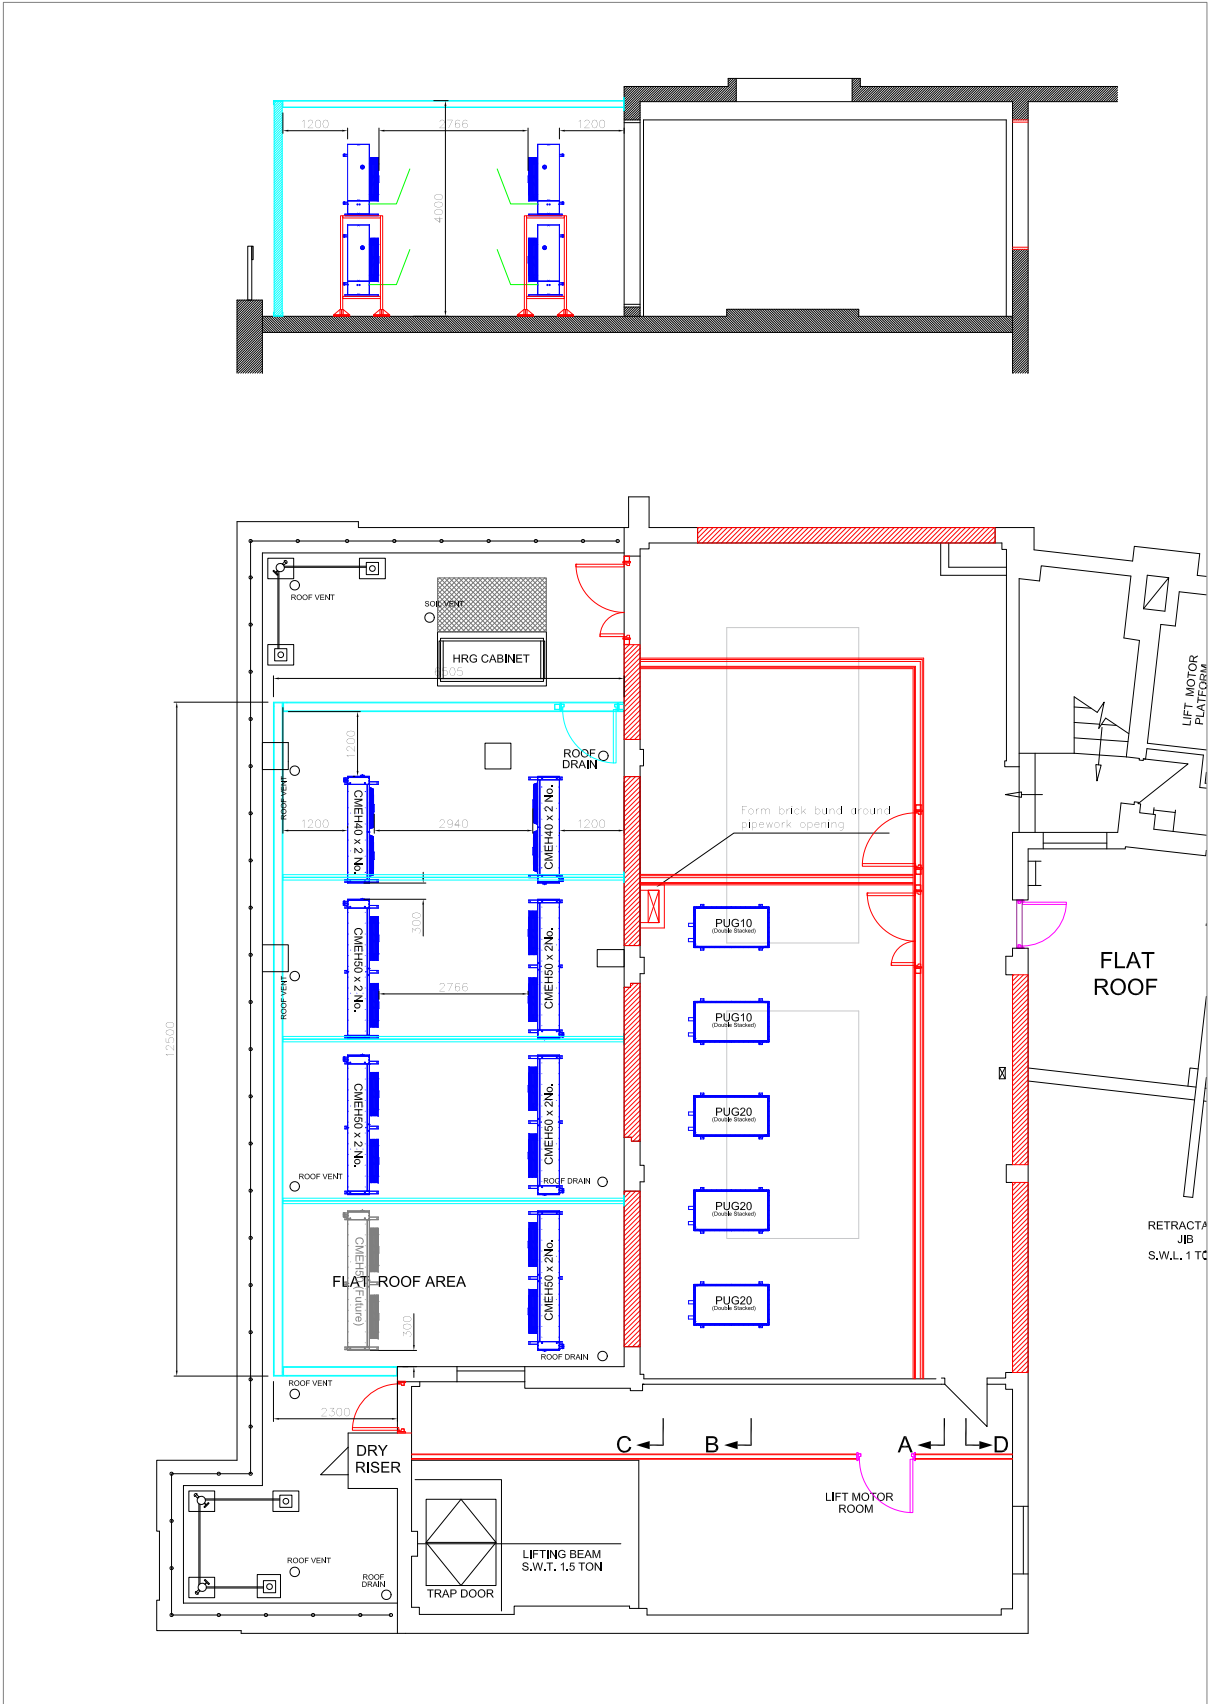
Maida Vale TE – Proposed Roof Layout Plan
